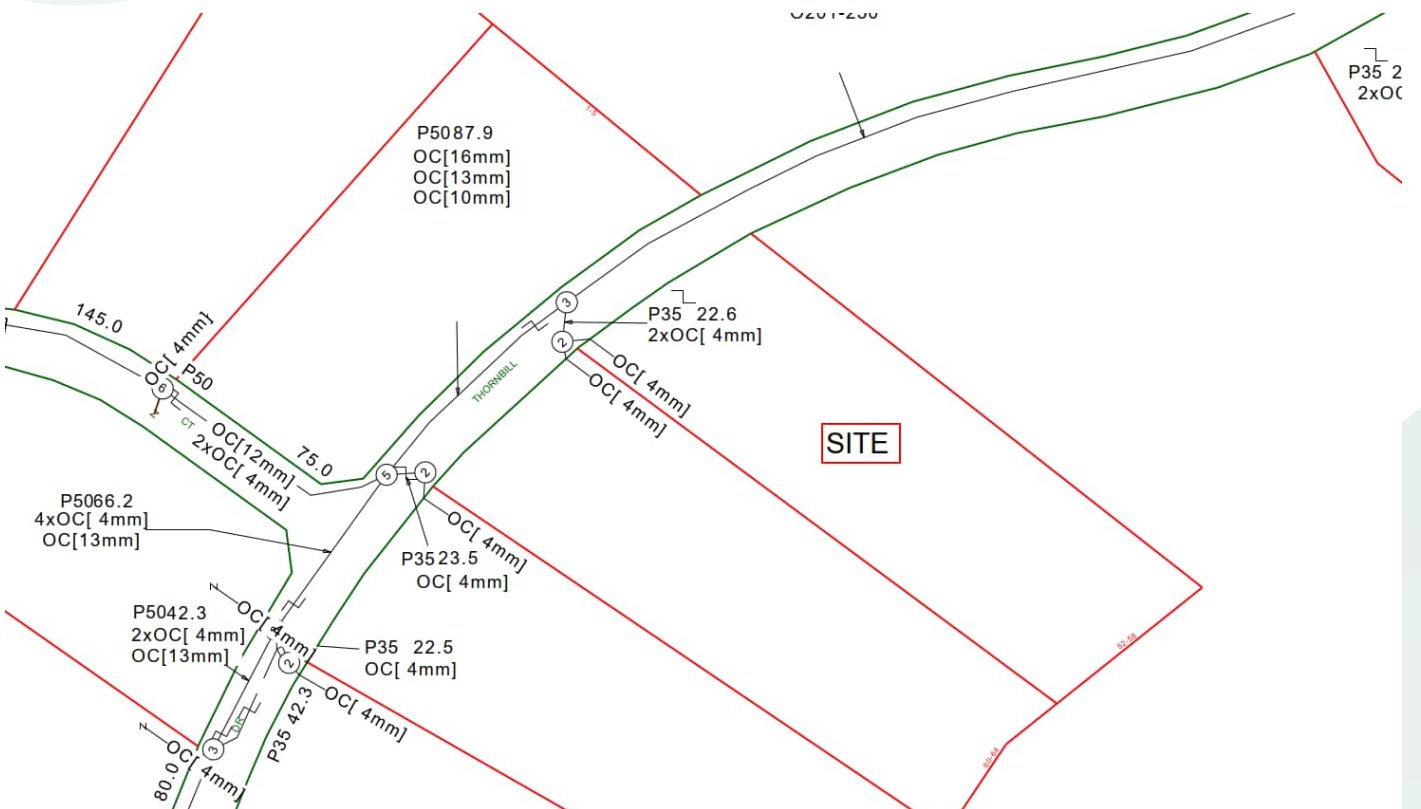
Existing Telstra Network (Source: BYDA, 2025)
